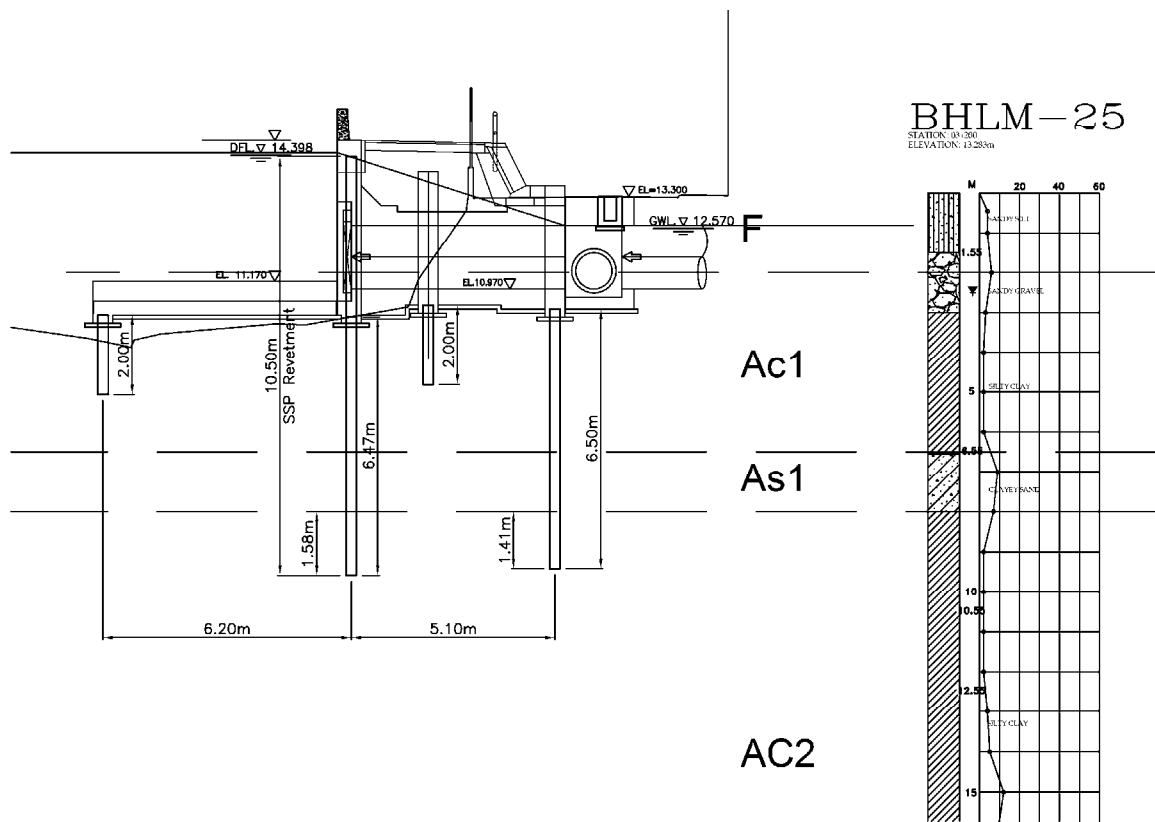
Length of SSP Cut off Wall (8/9) (MSR-3)
